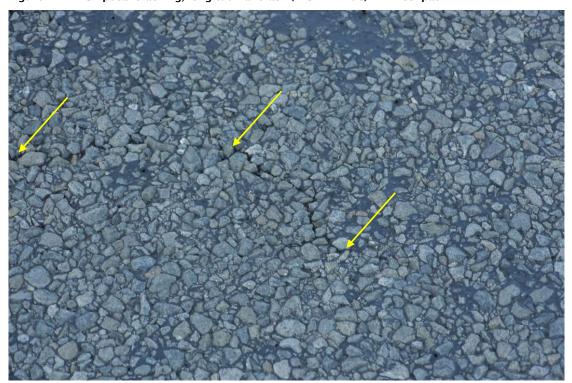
Chipseal cracking, longitudinal crack (2-3mm wide) in wheel path
